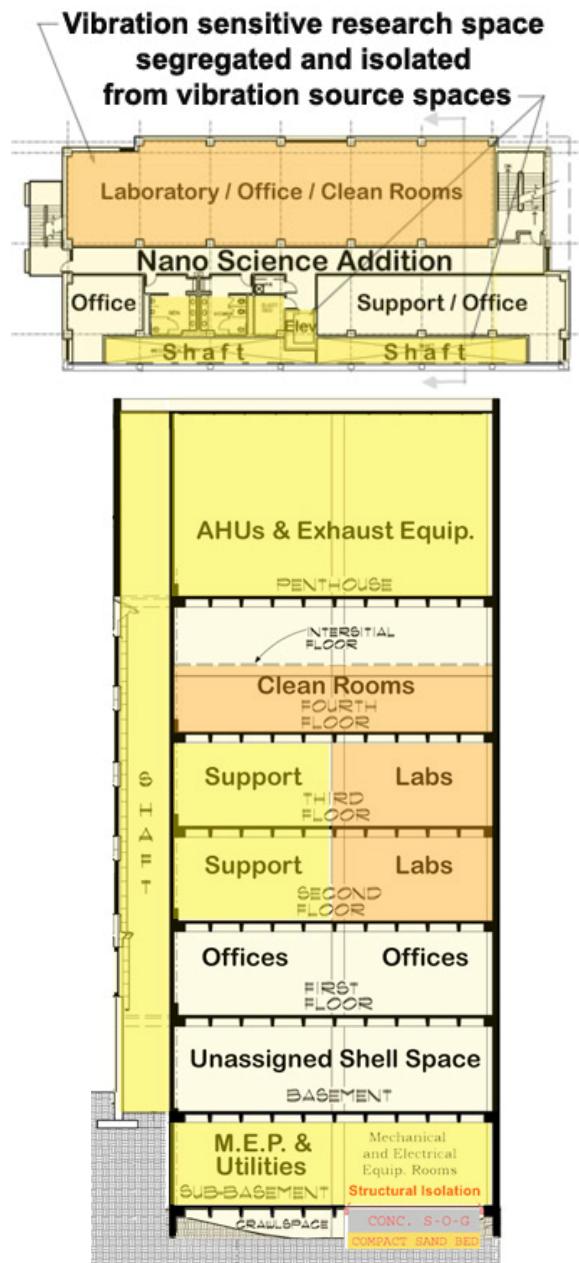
Vibration Control in Research Building, Floor Plan (top) and Building Section (bottom)⁴²
